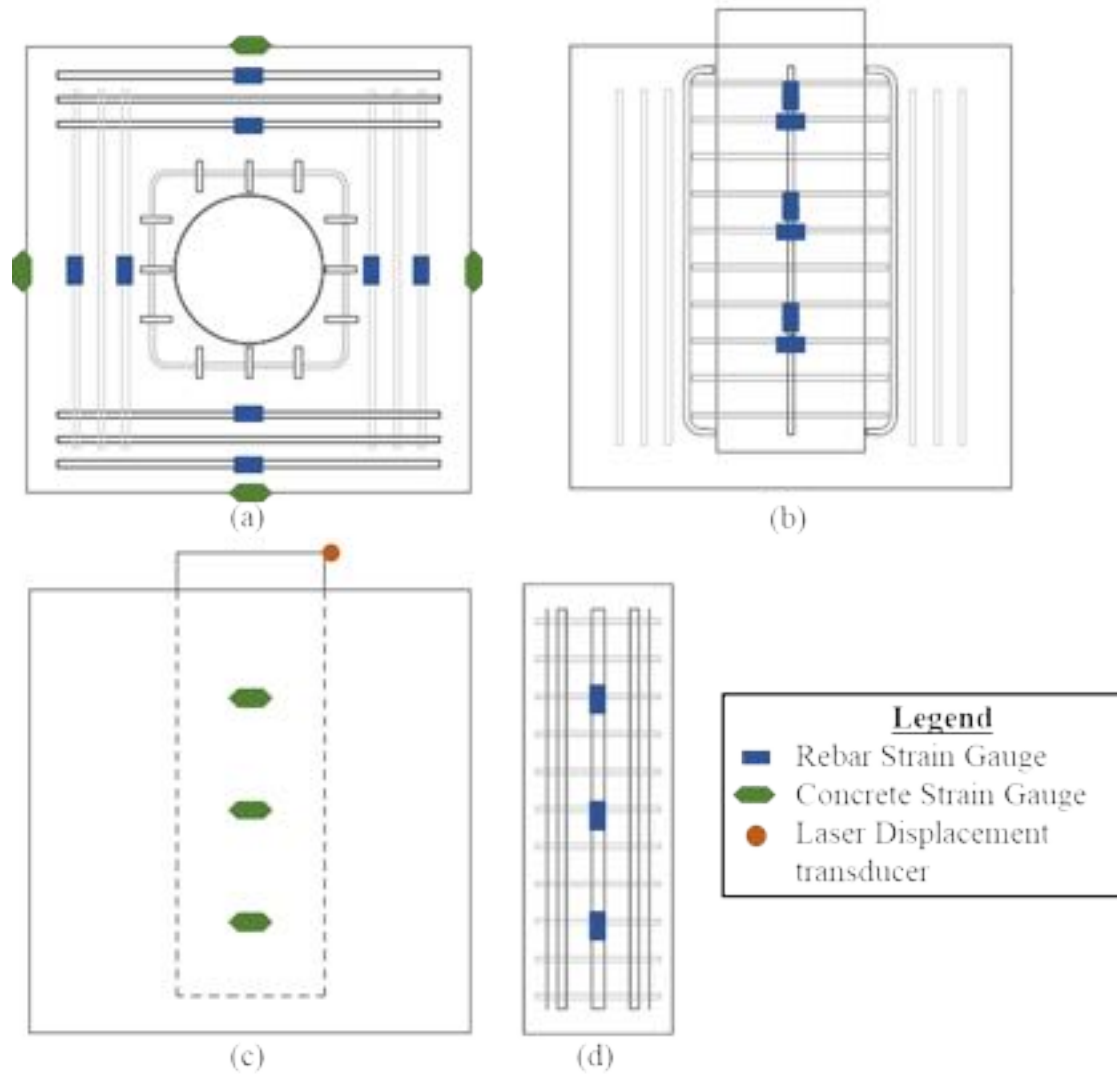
Instrumentation plan for Series I specimens: (a) pile cap bottom view (b) cap-elevation (c) pile cap, and (d) plug elevation.
